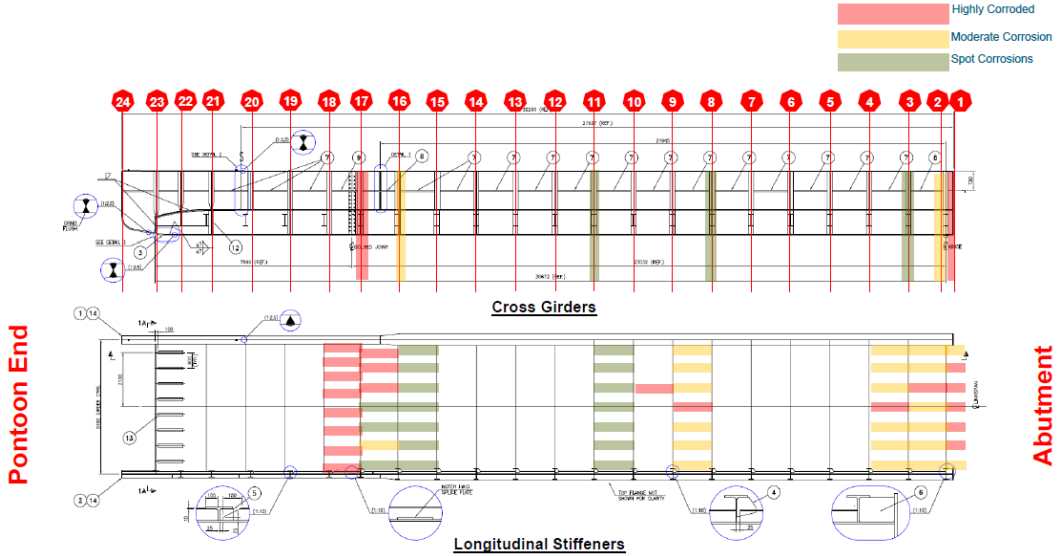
Highly Corroded Cross Girder at Pontoon End.
